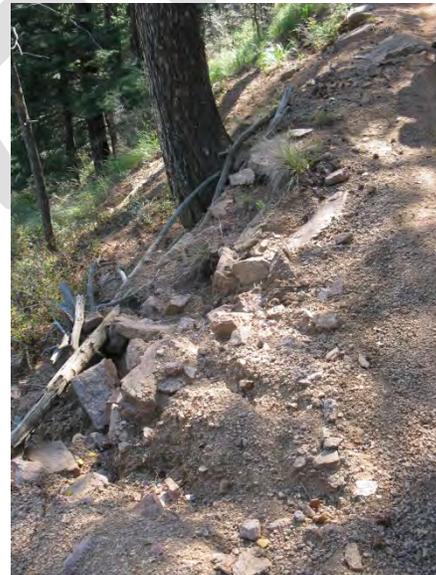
Bare, eroding slope. Possible Solutions – construct outslope retaining wall.
